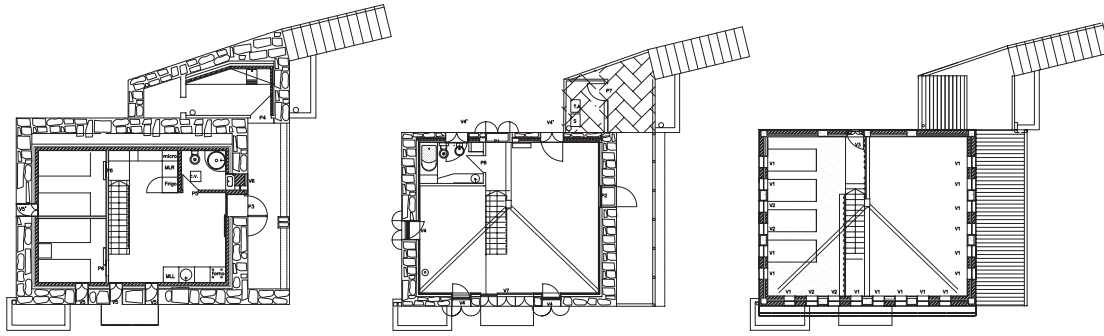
The new floor plans: ground floor (left) , first floor (middle) and mezzanine (right)
